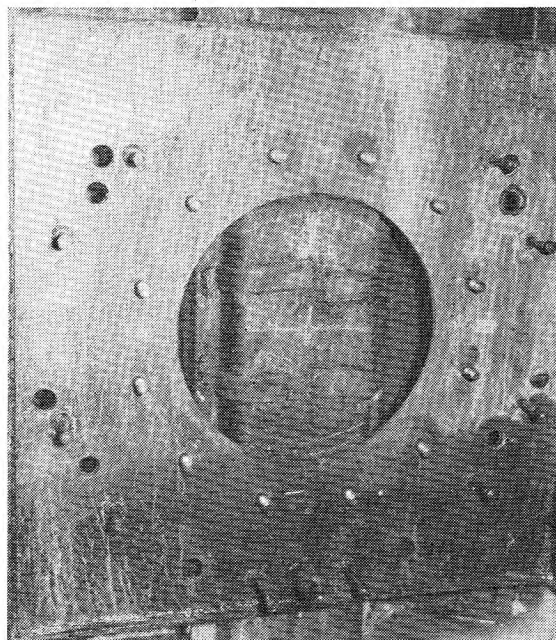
PLATE WELDED TO PILING TO FORM DATUM FACE
